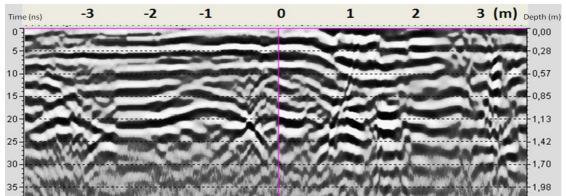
GPR cross section of a widened section of the N59 road in Ireland. This shows that road has been widened to the right side and that the structures on the widened side are totally different than those in the old road.
